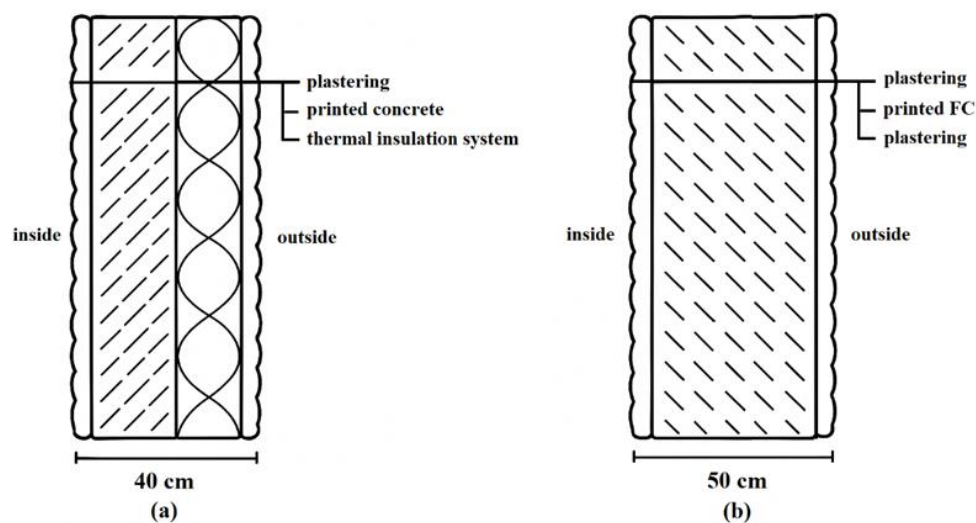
Schematic of wall cross-sections: (a) CONPrint3D® wall with conventional insulation and plastering, (b) entire wall cross-section made of FC with CONPrint3D® technology [3]
